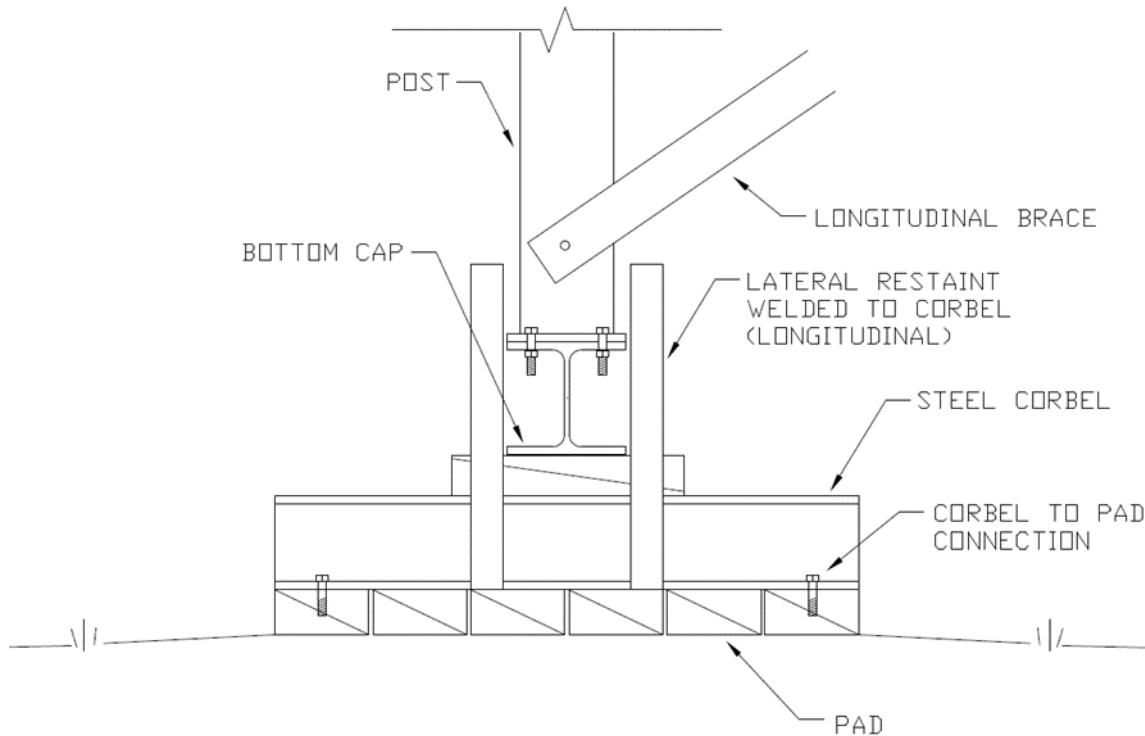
Typical Mechanical Connection Allowing Adjustment (vertical)
